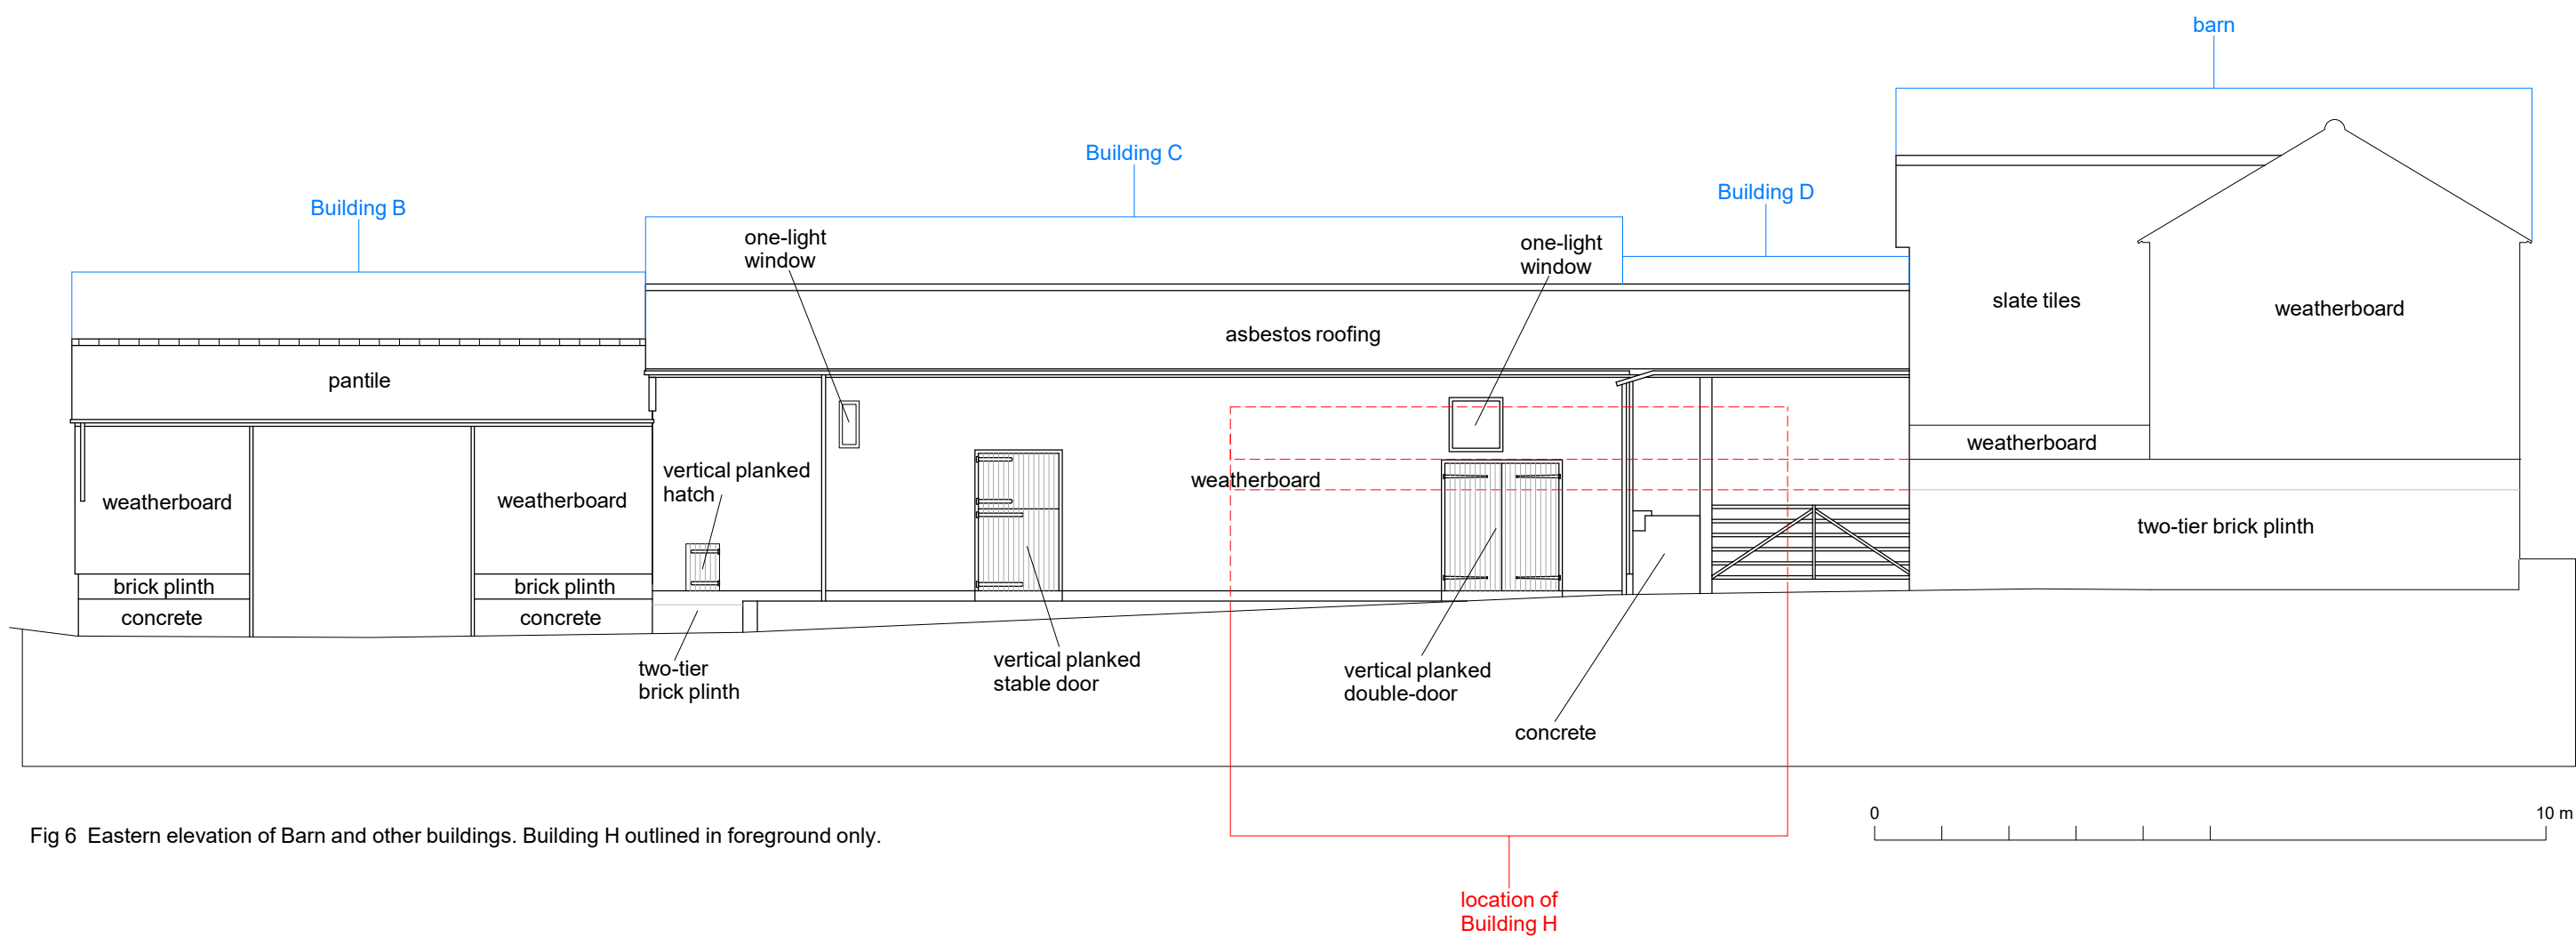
Eastern elevation of Barn and other buildings. Building H outlined in foreground only.
